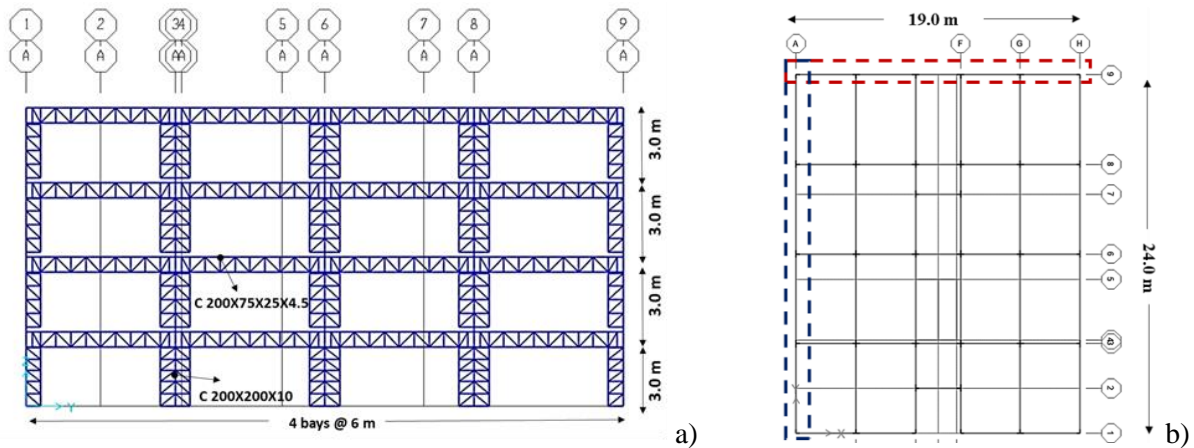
Plan view of the building (a); Typical elevation of the building (a)
